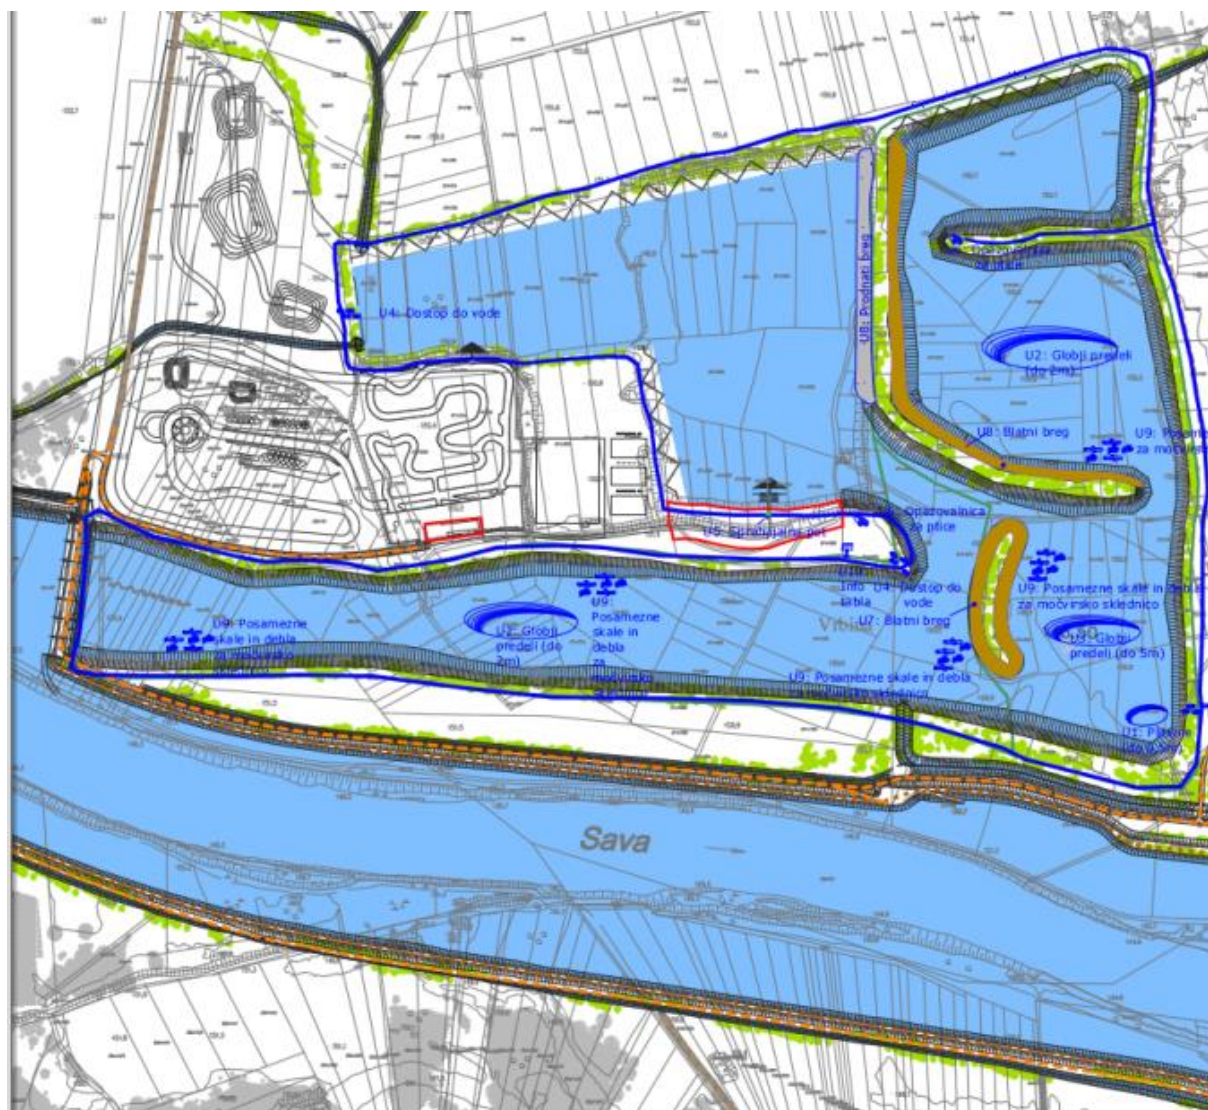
SH1 and SH2 construction plan<sup>24</sup>
